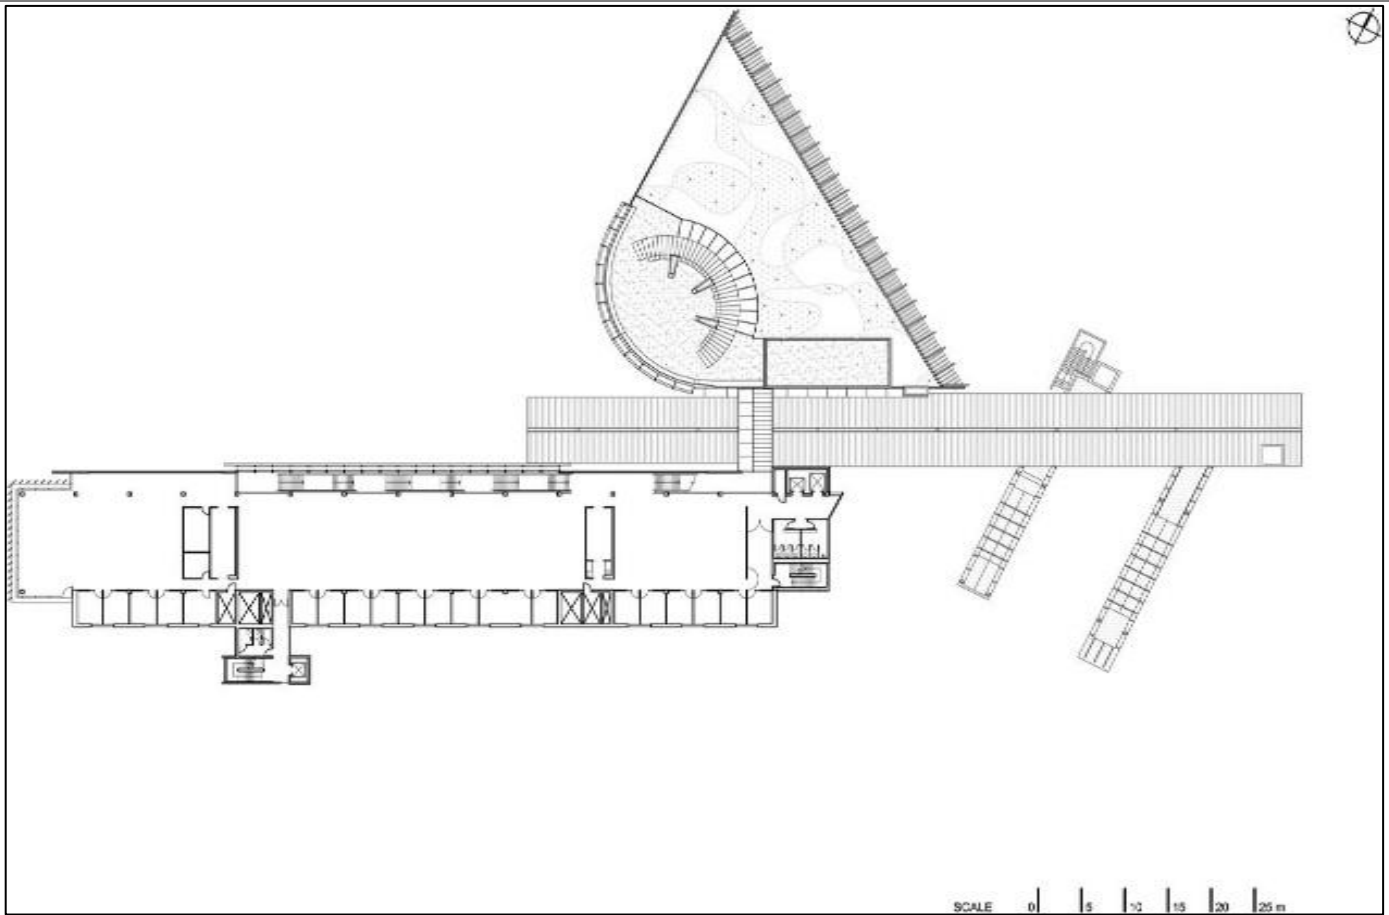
Open floor plan showing circulation pattern and flexible spaces
